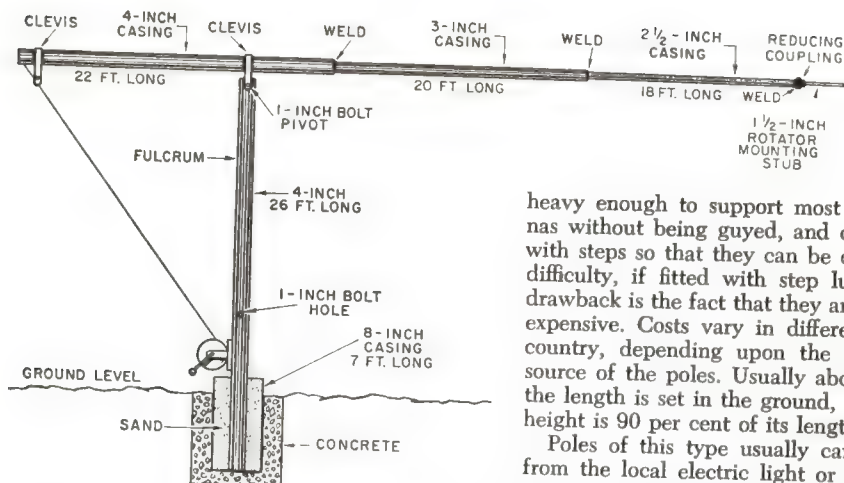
Sketch showing the over-all design of the steel tilt-over mast. Sections are telescoped about 4 inches before welding.
